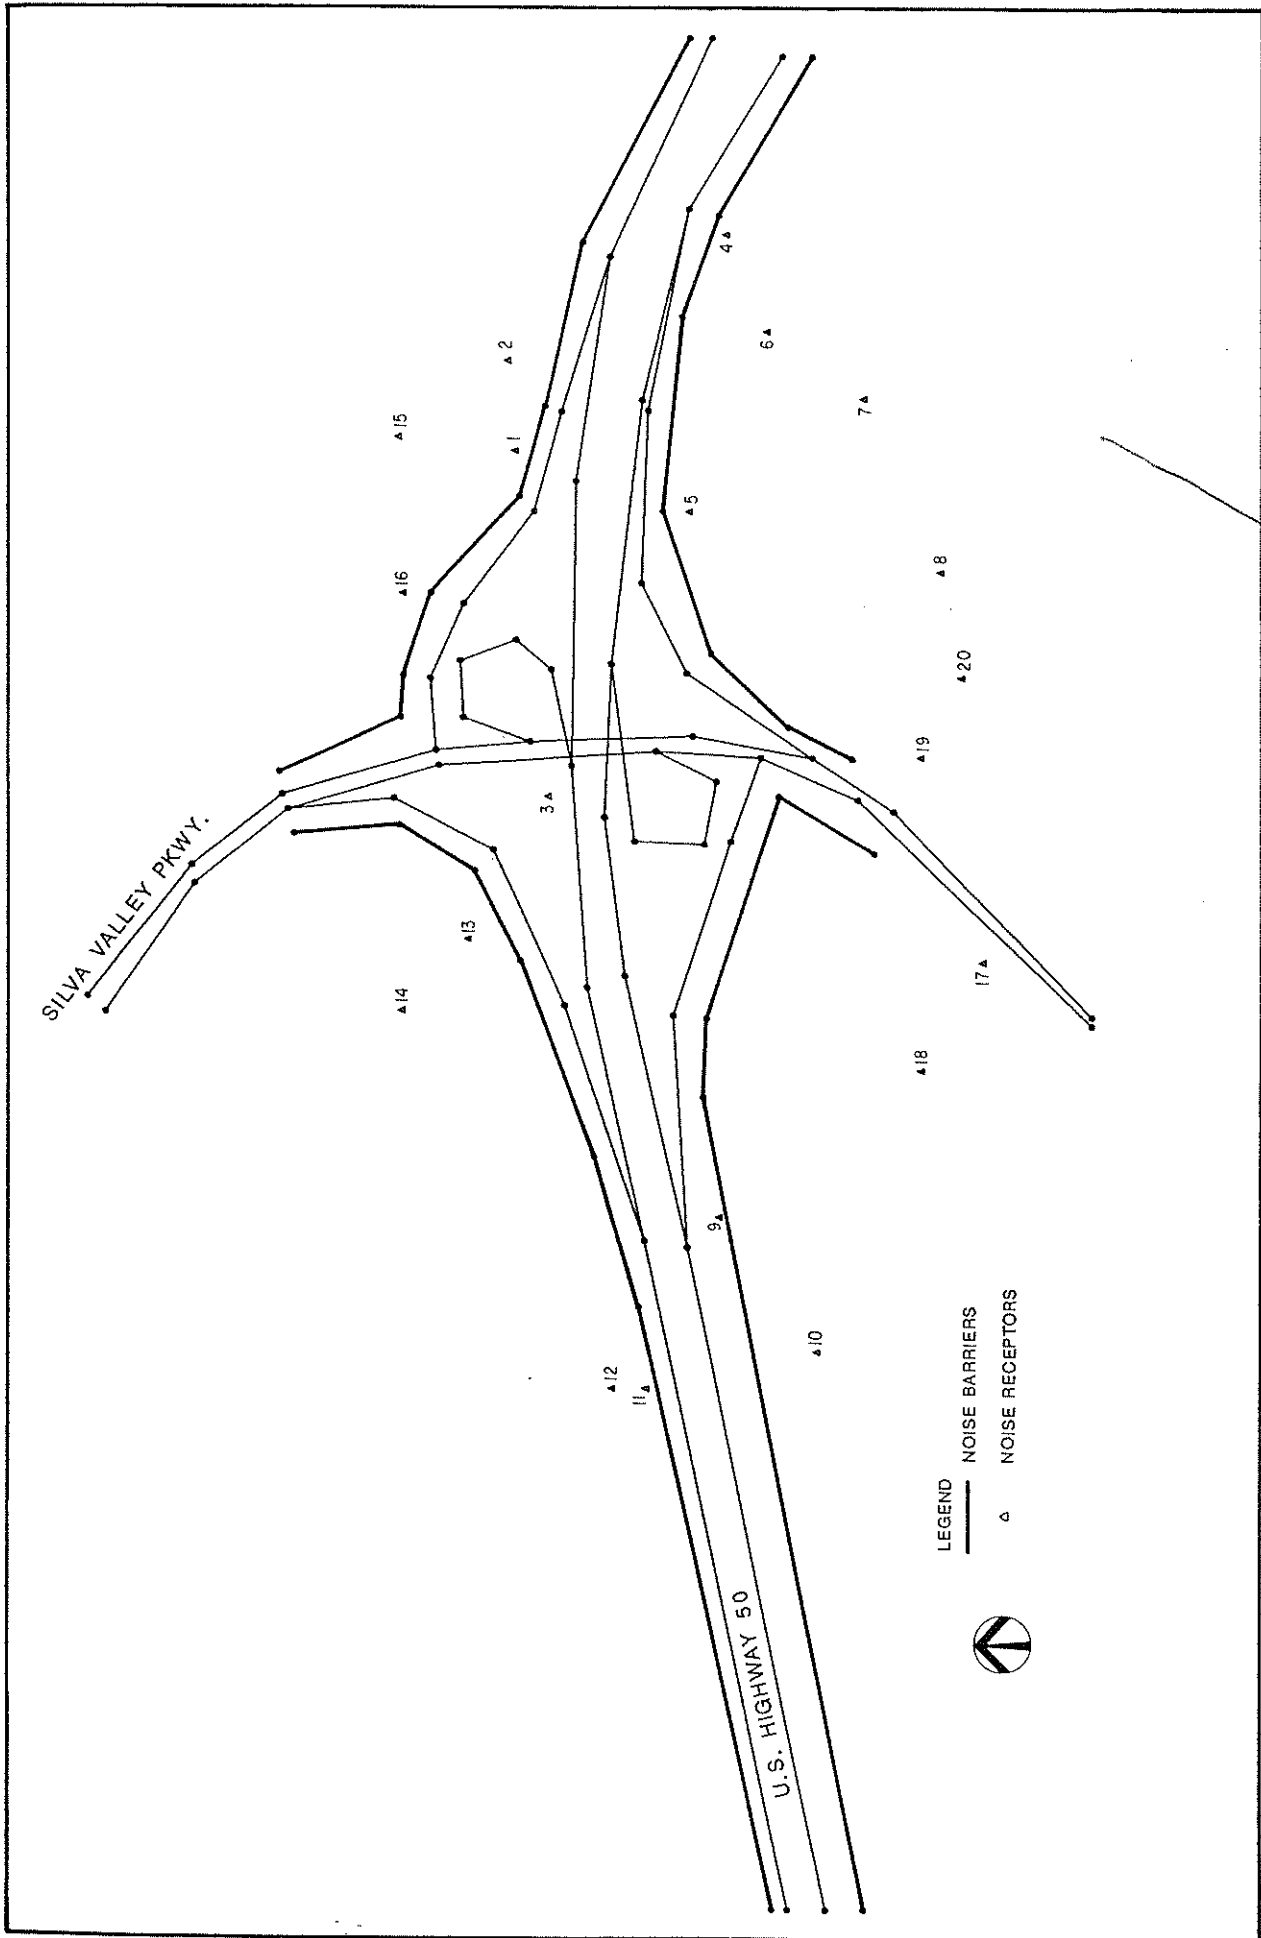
RIDGE DESIGN ROADWAYS, NOISE RECEPTORS, AND BARRIERS
